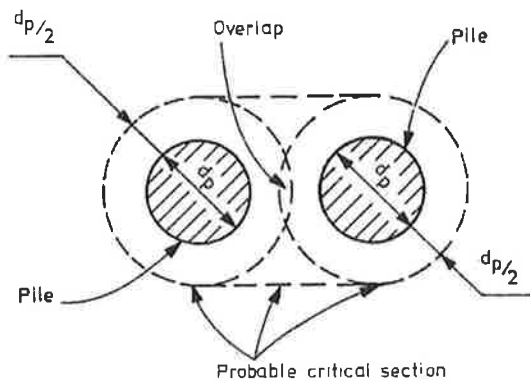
MODIFIED CRITICAL SECTION FOR PERIMETER SHEAR WITH OVERLAPPING CRITICAL PERIMETERS
